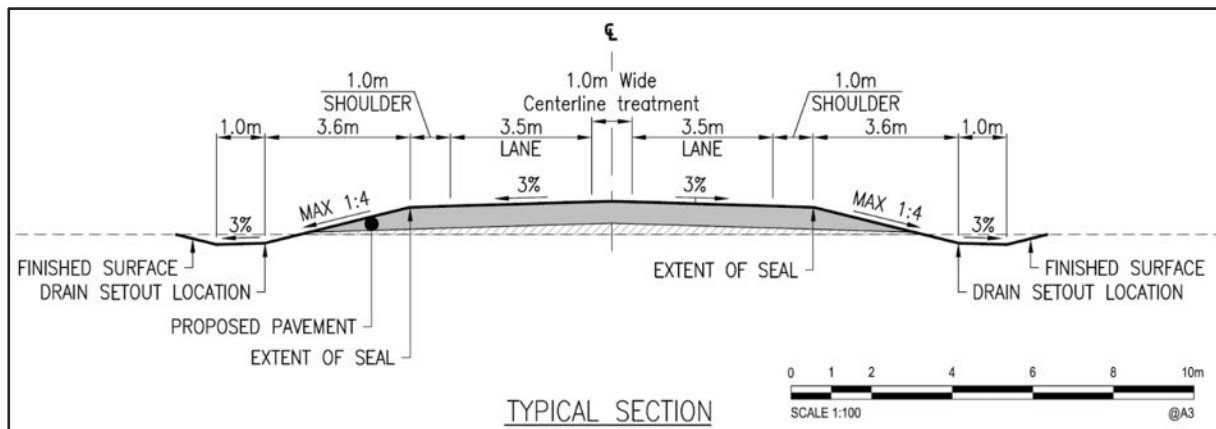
Moura-Baralaba Road—concept design of diverted section (Stantec, 2023)
